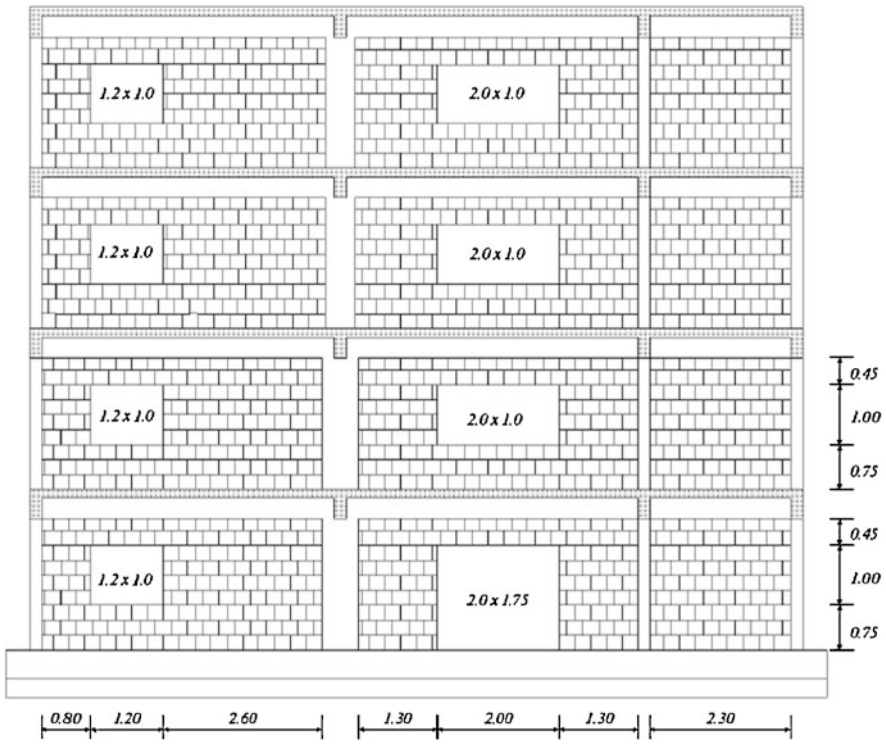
Elevation view of the infilled frame—location and dimensions of openings [53]
